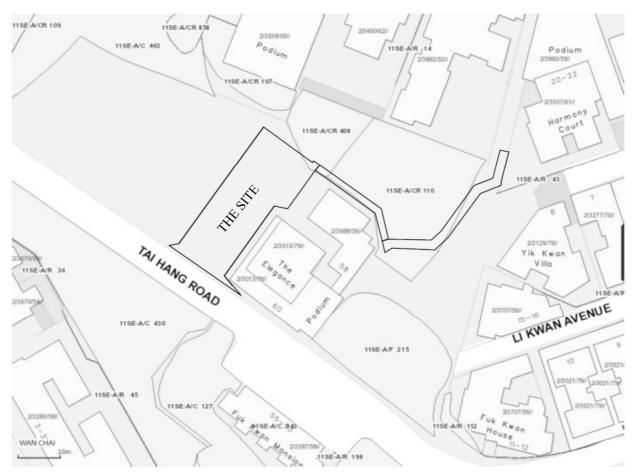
Layout of Adjacent Buildings with BD reference nos.
